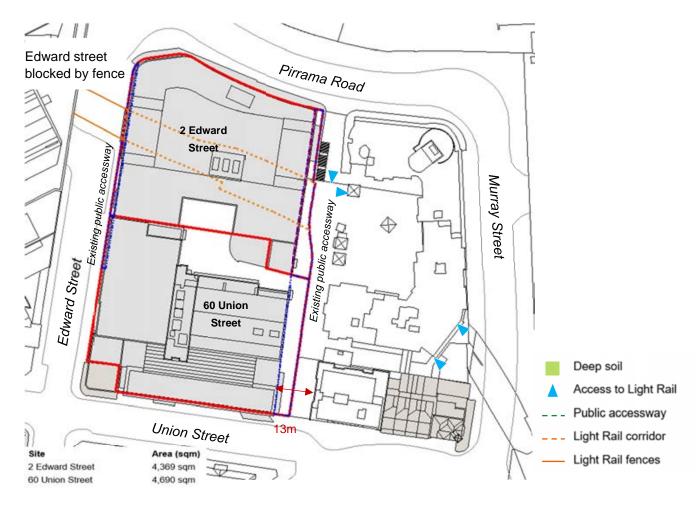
existing site plan for 2 Edward Street & 60 Union Street
